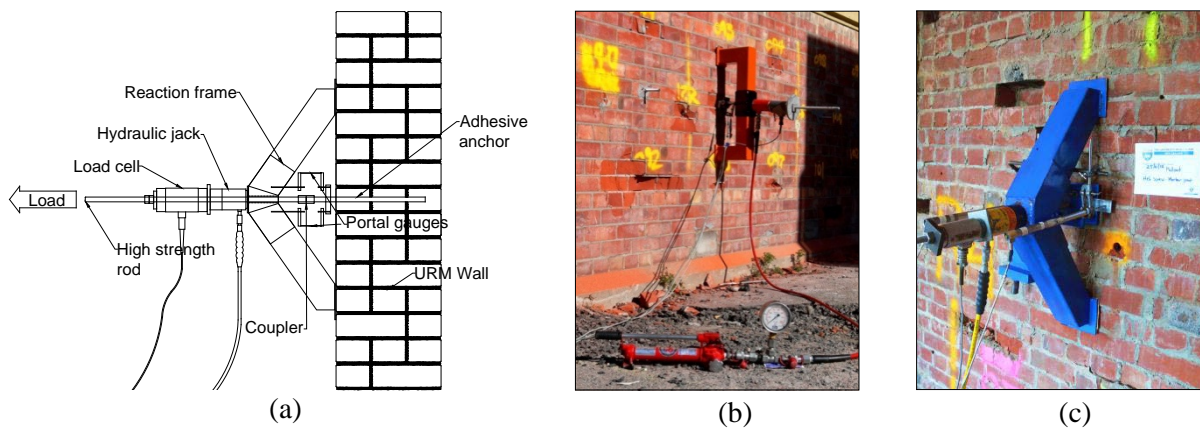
Test setup for adhesive anchor pull-out tests: a) Schematic view of the typical pull-out test apparatus; b) Typical test set-up used for pull-out anchor testing used in Christchurch; c) Typical test set-up used for pull-out anchor testing used in Whanganui.
